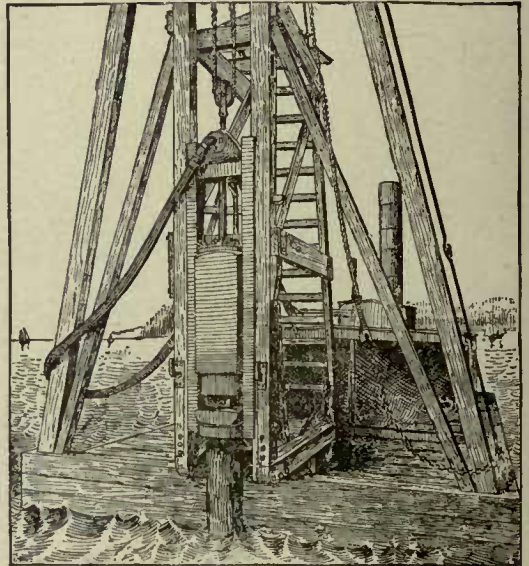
STEAM PILE-HAMMER IN OPERATION.
